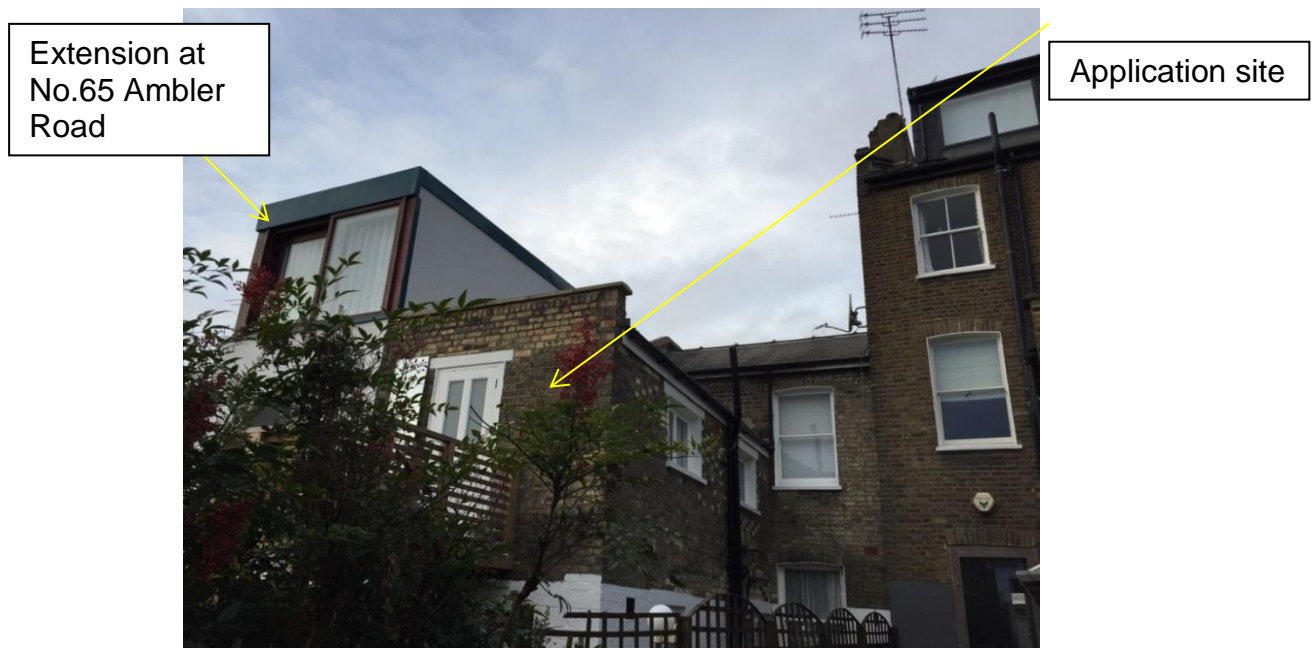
View of the rear elevation from No.61 Ambler Road, including the allowed (at appeal) second floor extension at No.65 Ambler Road, the proposed extension at No.63 will be attached to the allowed extension.
